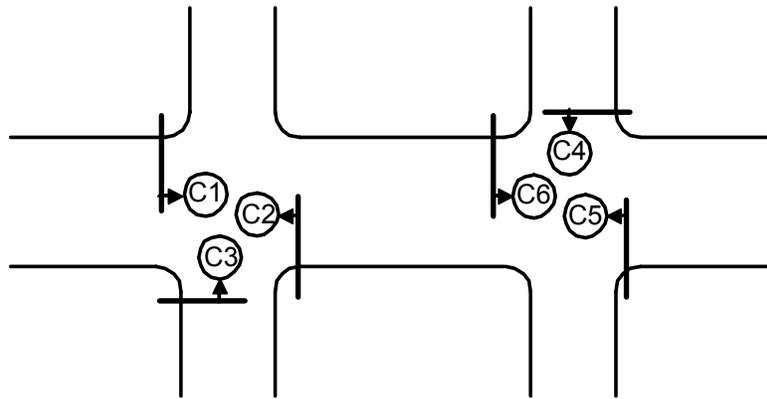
VIVDS Camera Layout for a Typical Diamond Interchange.
